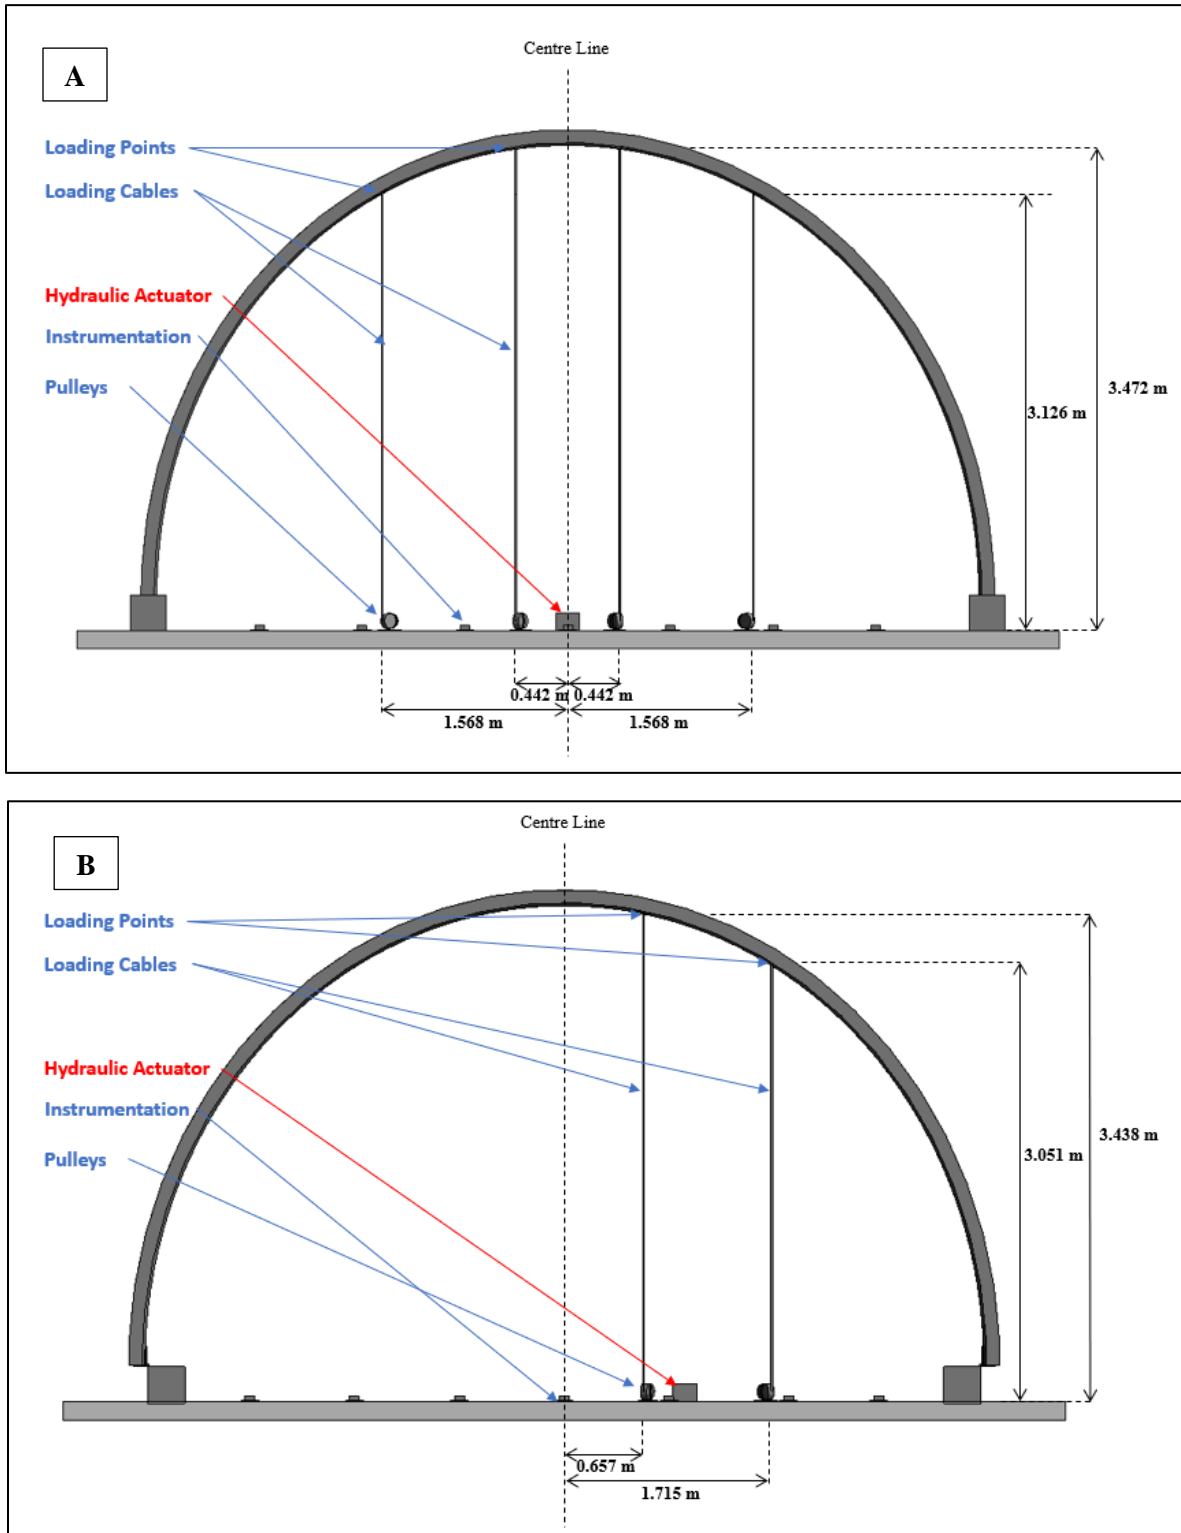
Side View Loading Dimensions for Balanced (A) and Unbalanced (B) Loading Patterns
